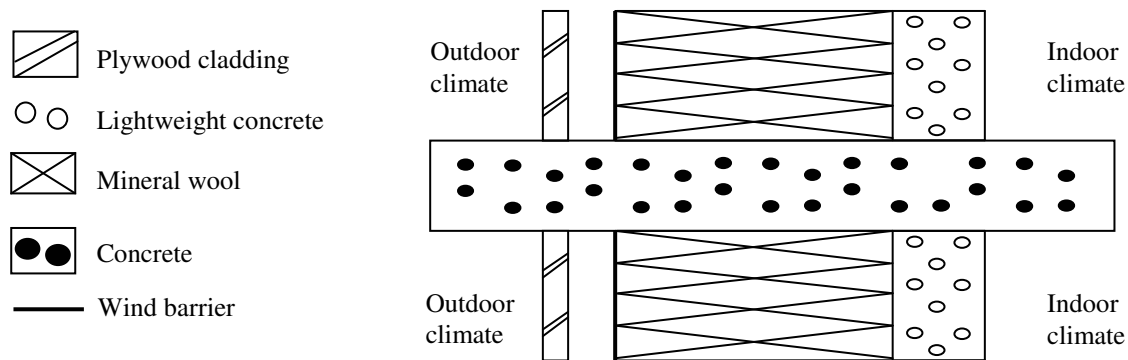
Building detail selected for analysis. Two rooms, connected to the outdoor climate by a lightweight concrete wall consisting of a plywood cladding, a wind barrier, mineral wool insulation and a lightweight concrete layer. The surface heat and moisture transfer coefficients near the corners are relatively low compared to the surface transfer coefficients in the centre of the components
